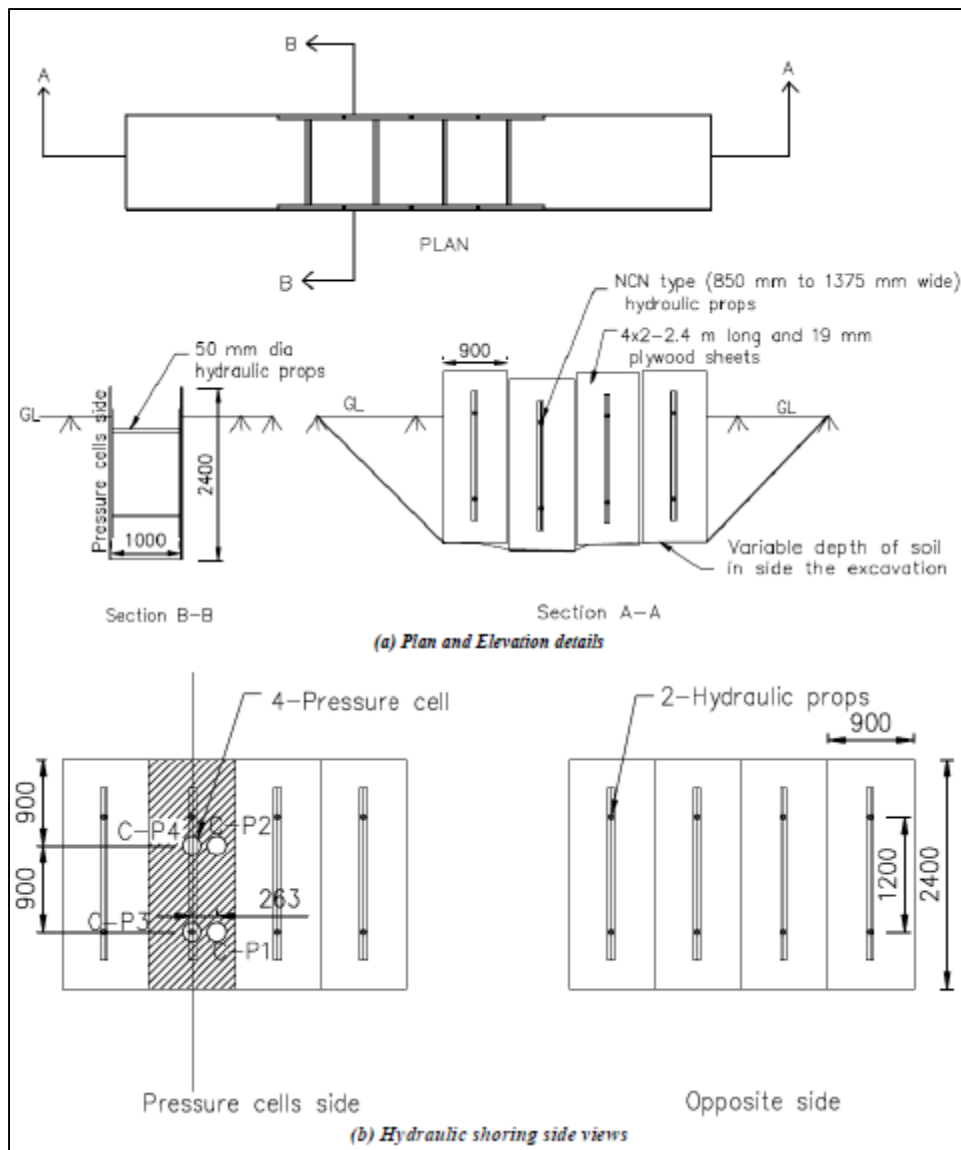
Test setup details for Hydraulic shoring (with plywood sheeting) in trench excavation
